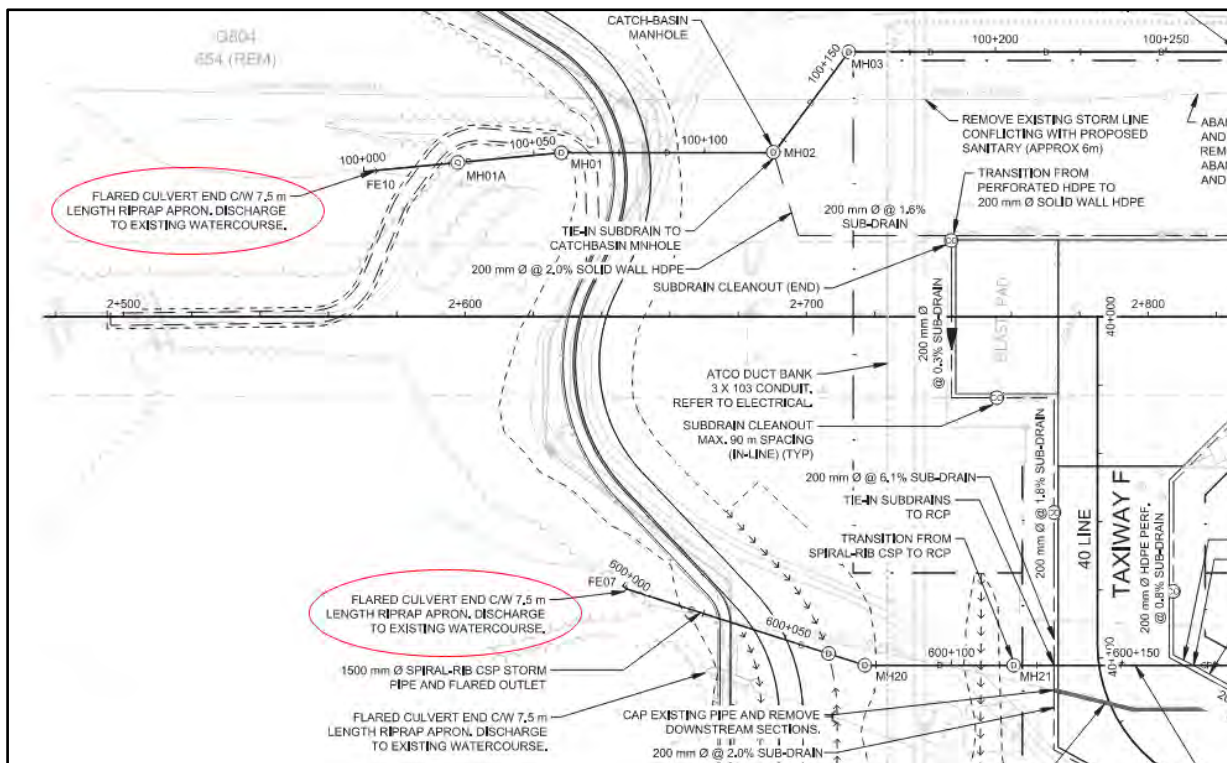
Proposed Stormwater Outfalls into Baxter's Gulch
